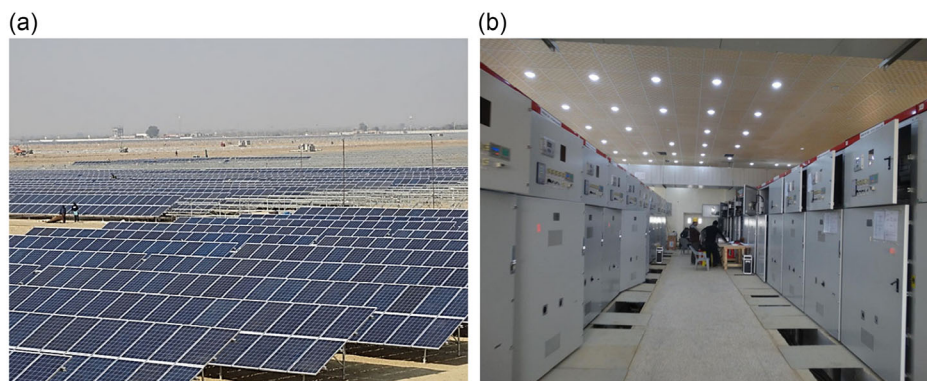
a) Installed external grid equipment at solar power plant. b) Installed internal grid equipment at solar power plant.
